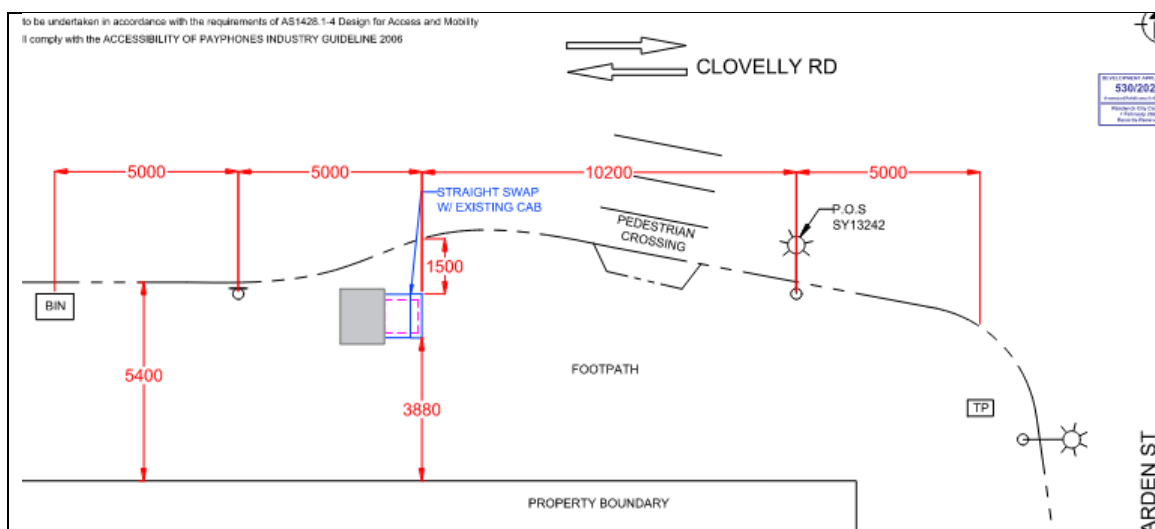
Site plan showing location of existing (pink dashed line) and proposed payphone (blue line). Please note dimensions shown in the above plan are incorrect noting that the clear way between the payphone and property boundary of shopfronts at No. 272-282 Clovelly Road measures 2.5m.
